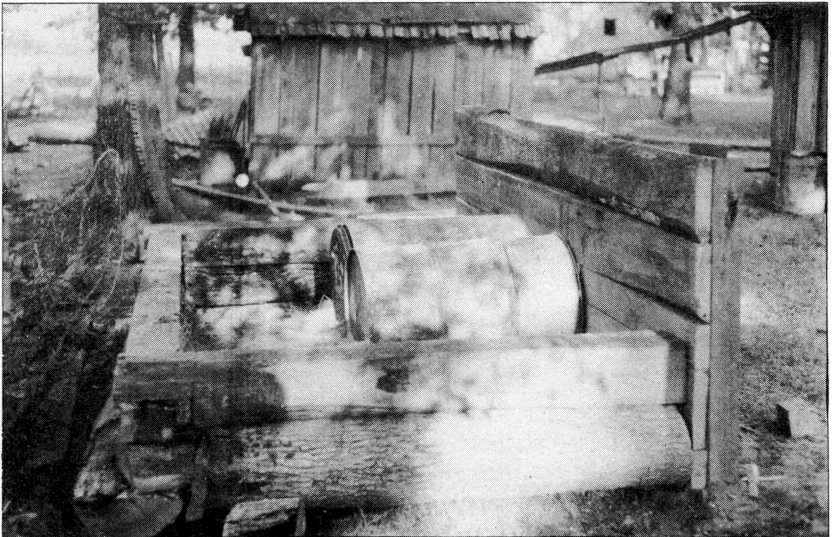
Completed cooler showing ventilation stacks from oil drums.
